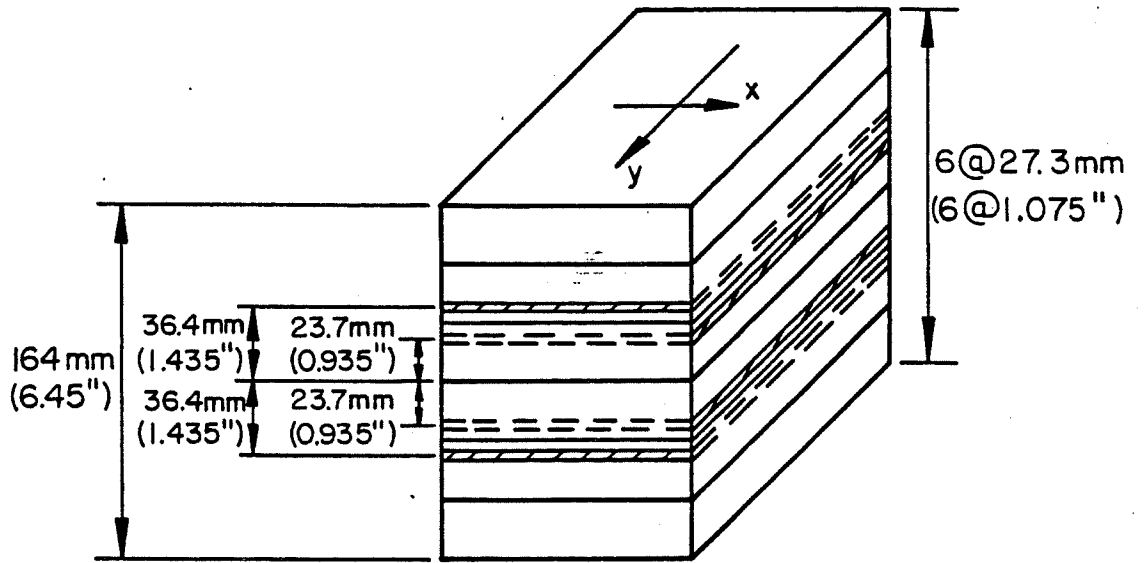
Example No. 1 (AASHTO Bridge 3B)
